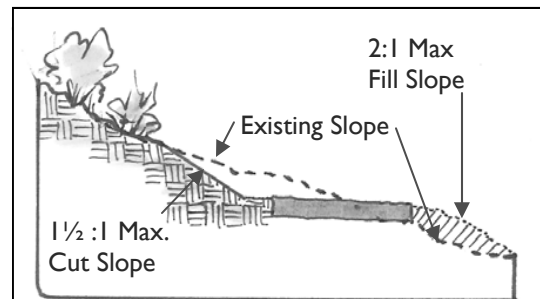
A Full Bench Trail, placed on cut portion of the slope only, provides a more stable base than a trail placed on fill material.
